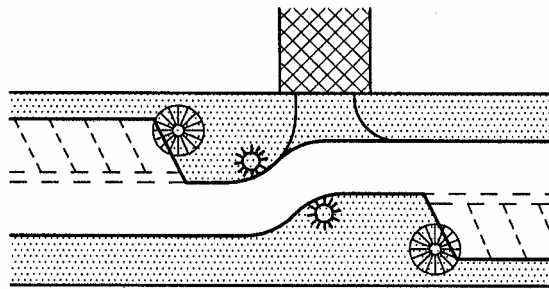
Chicane formed by raised surfaces forming parking lanes
